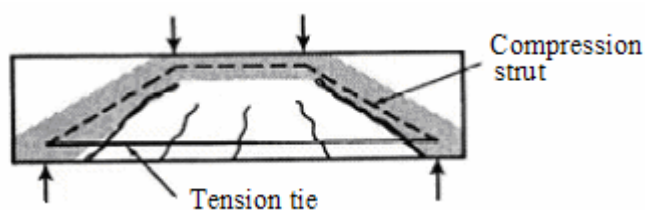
Anchorage failure and arch action behavior of a simply supported beam, from MacGregor (1997).
